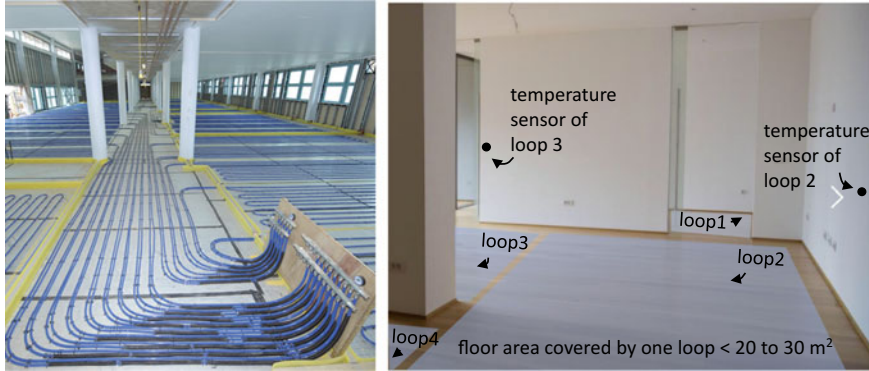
Organization of floor heating registers in an open space office building (left) (www.thermo-floor.co.uk) and in the flat of a residential building (right)
